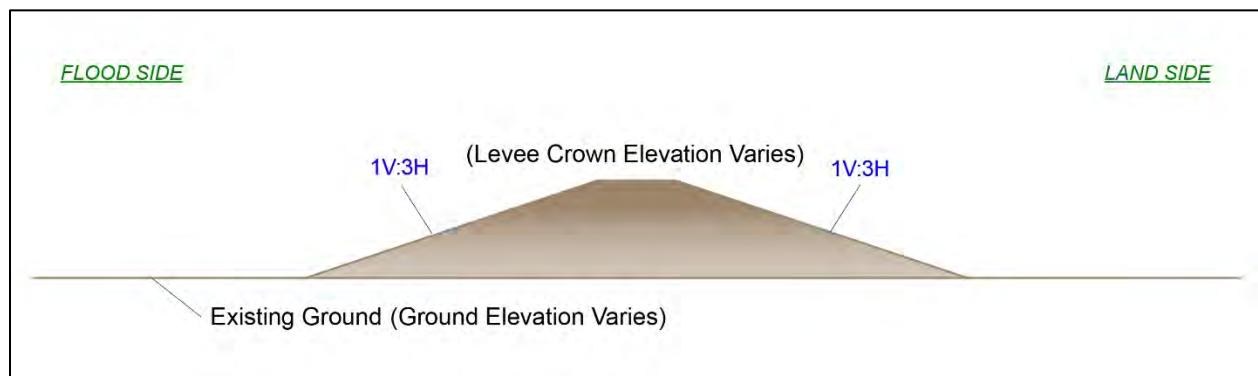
Typical Cross-section for South Slidell for Future Lifts
